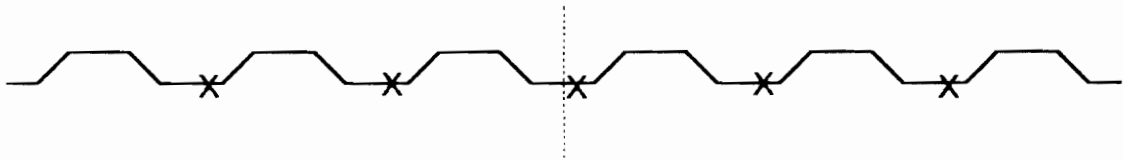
SDI-2/18-35-9 Concrete Strain Gage and Shear Stud Locations
